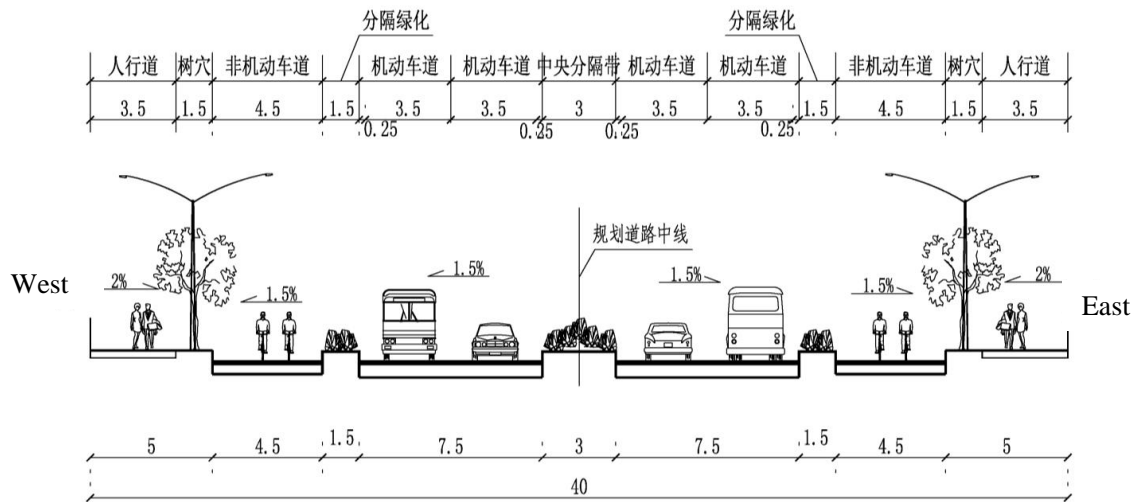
Standard Cross-section Scheme 1 for Zhanqian Road (Connecting Line of the Third Bridge to Anlu-Beijing Line)
